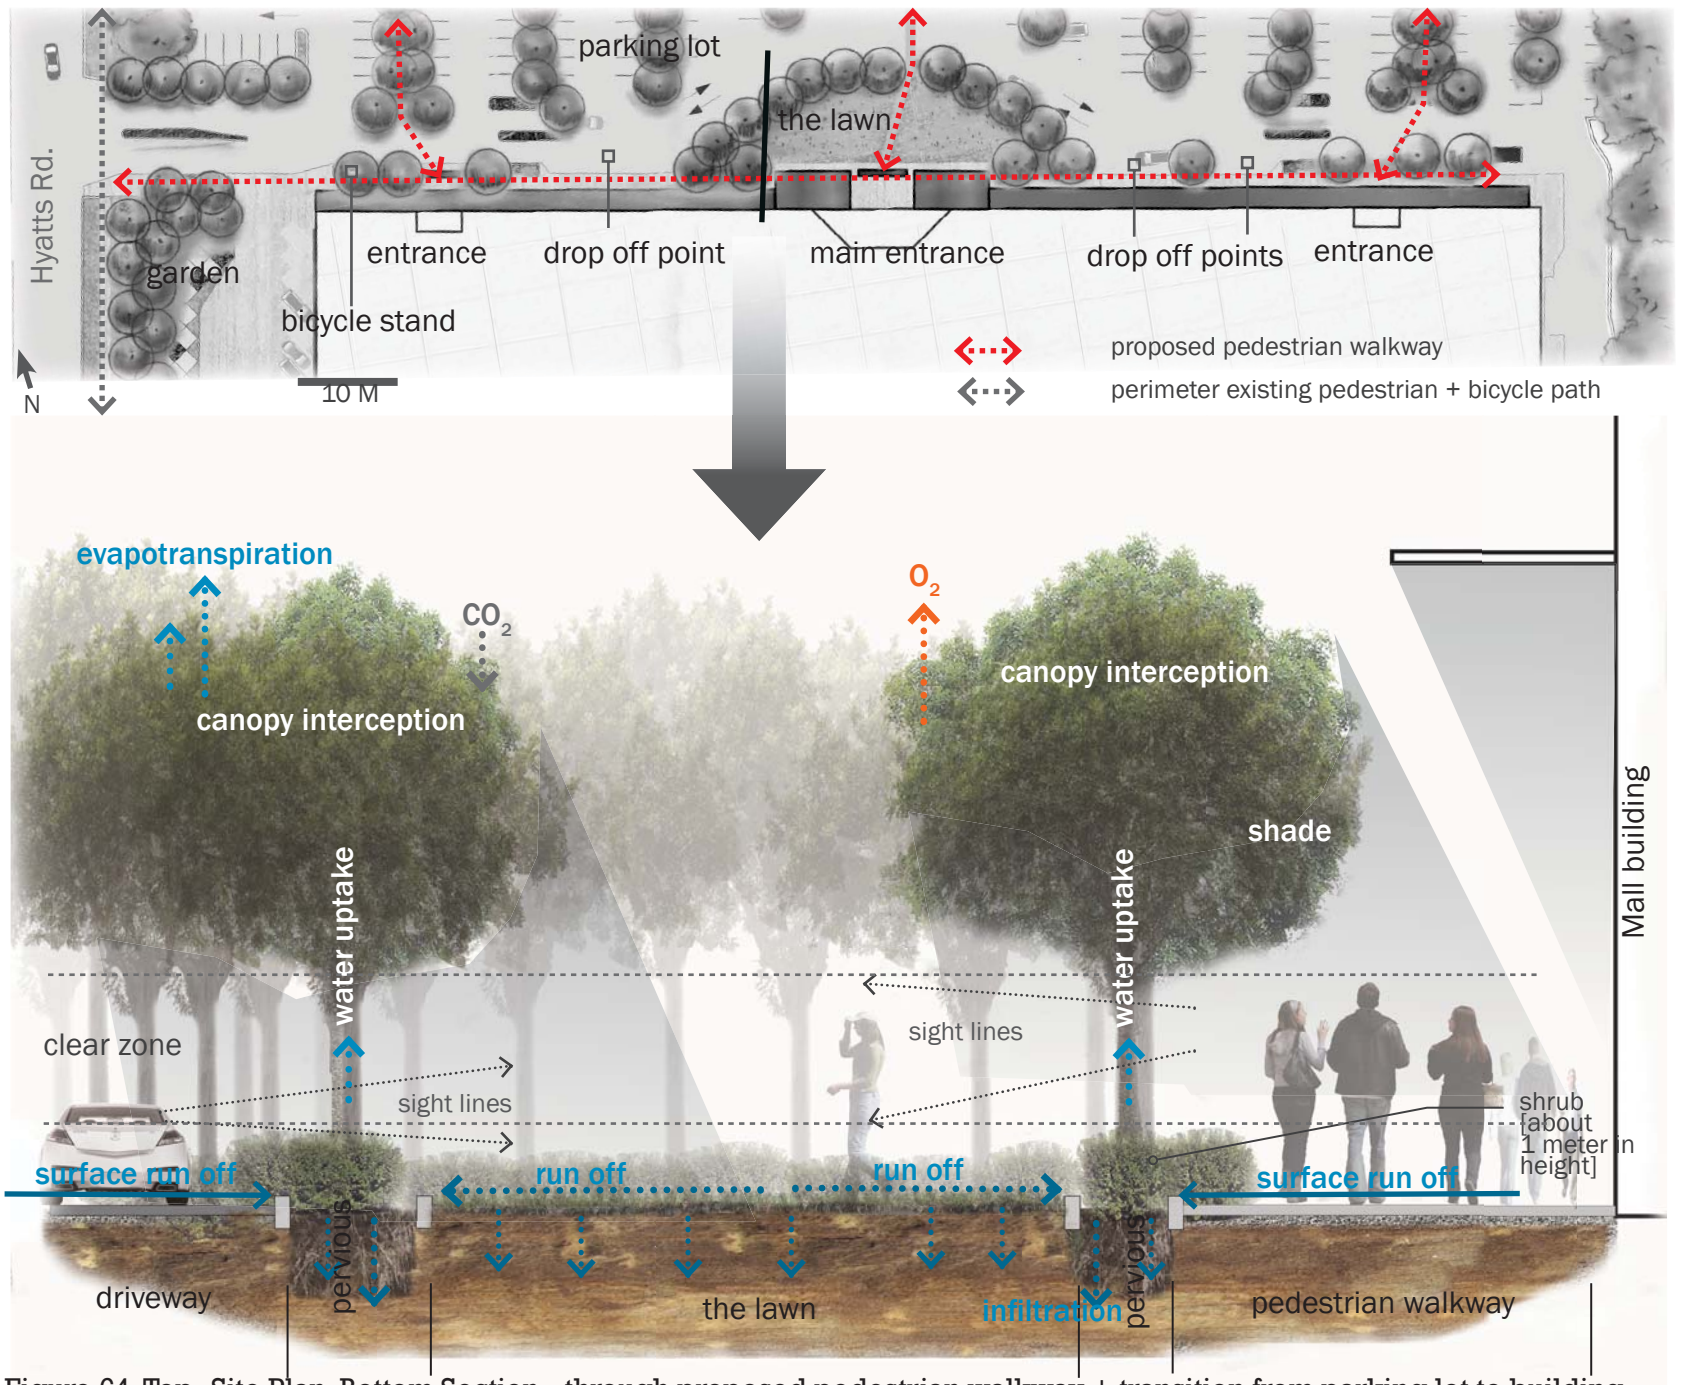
Top- Site Plan, Bottom Section - through proposed pedestrian walkway + transition from parking lot to building entrances.
